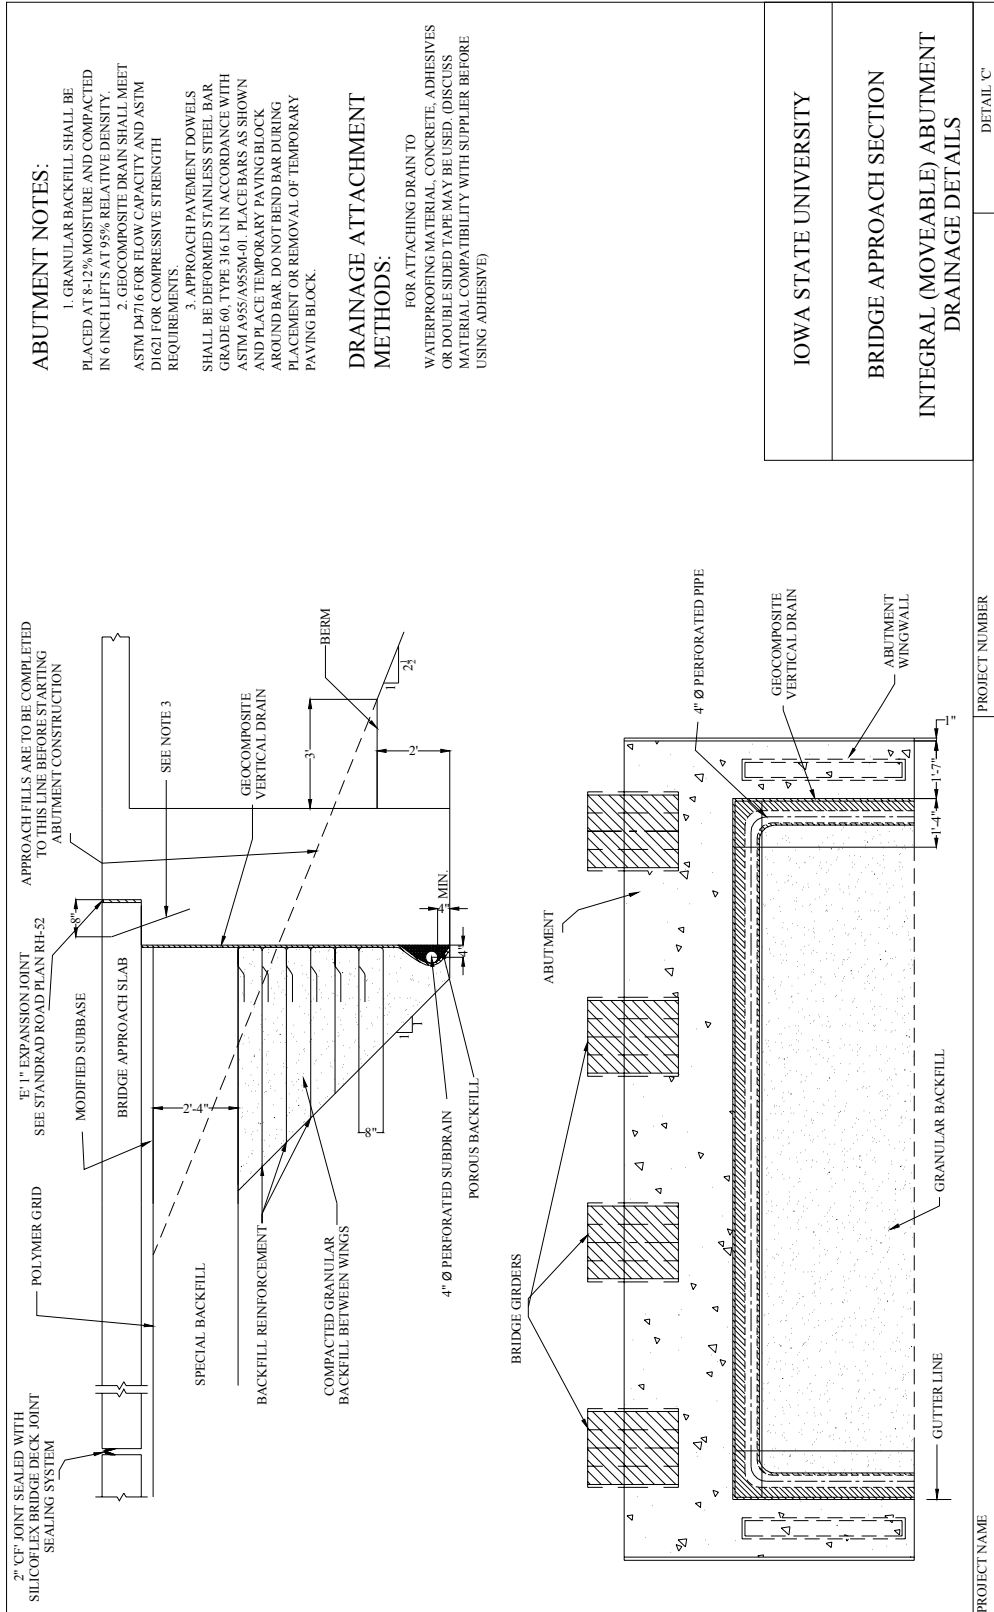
Proposed integral bridge approach drainage detail with geotextile reinforcement
